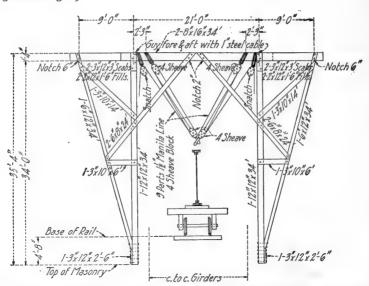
Details of a Gallows Frame. American Bridge Company.
